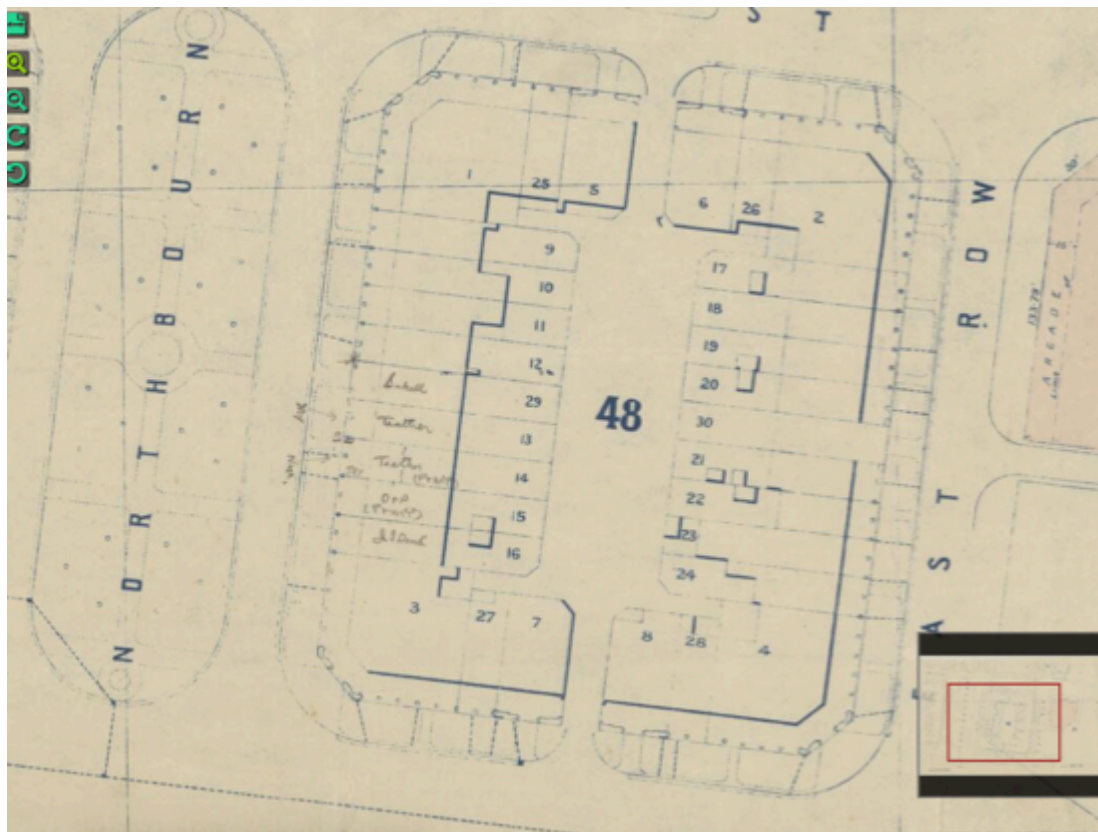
Plan of Sydney Building, land subdivision and adjacent spaces.
